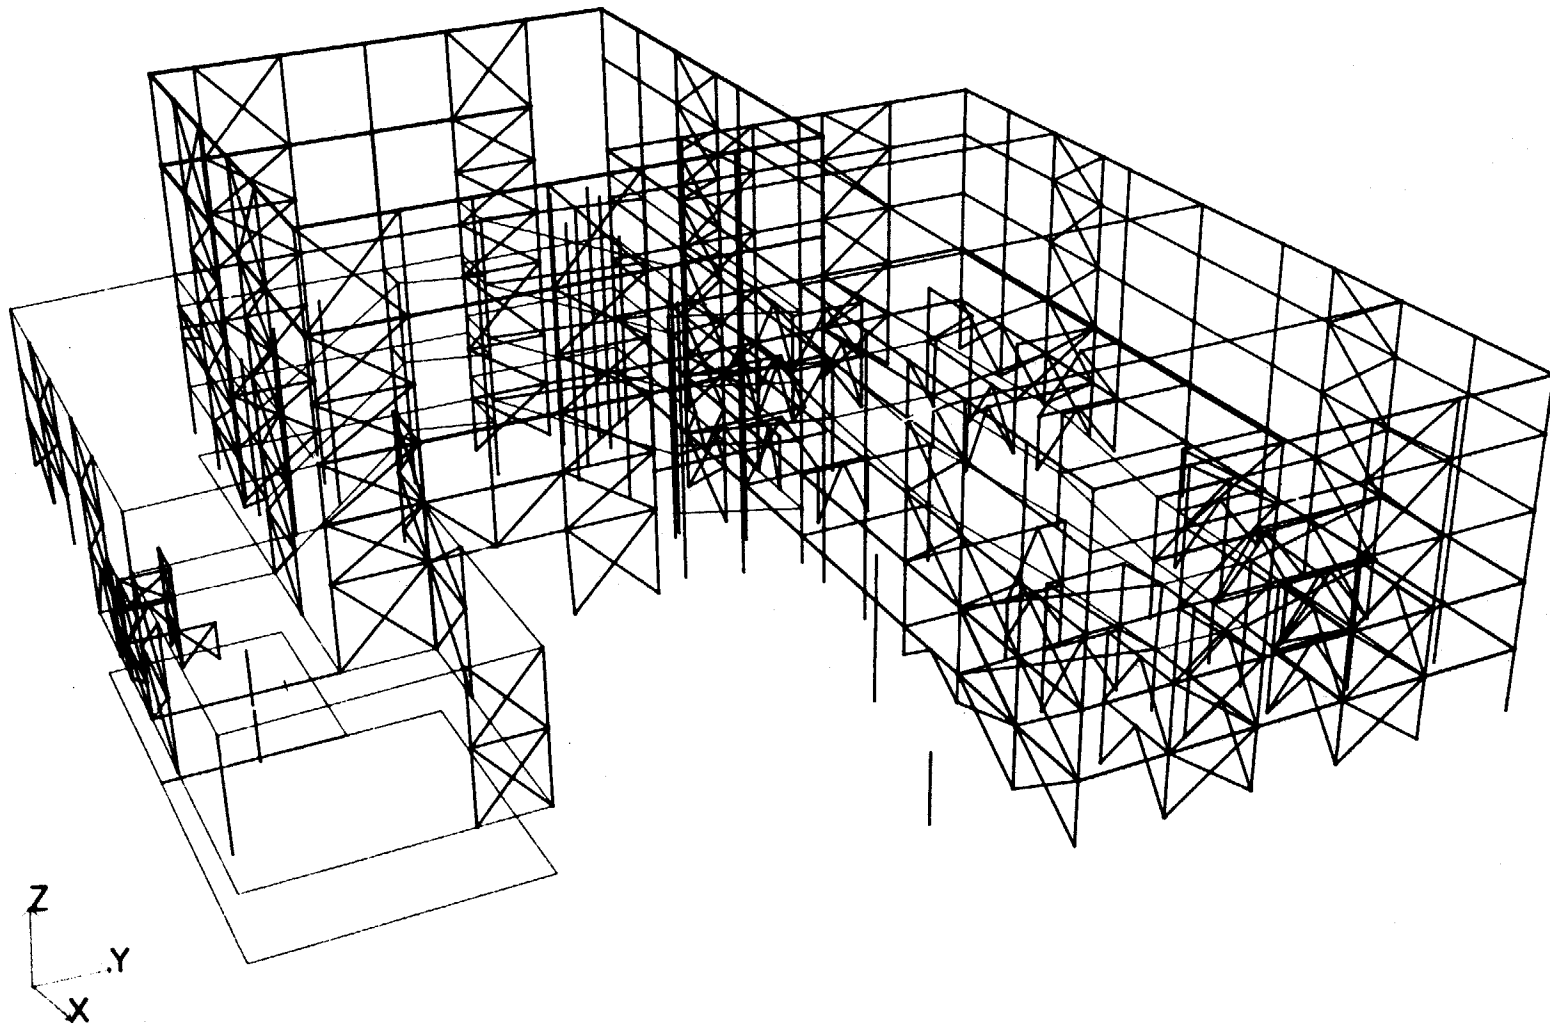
Details of the framing are shown in the three-dimensional SAP4 model of the interconnected building complex, which has 1213 beam elements and 686 nodes.
